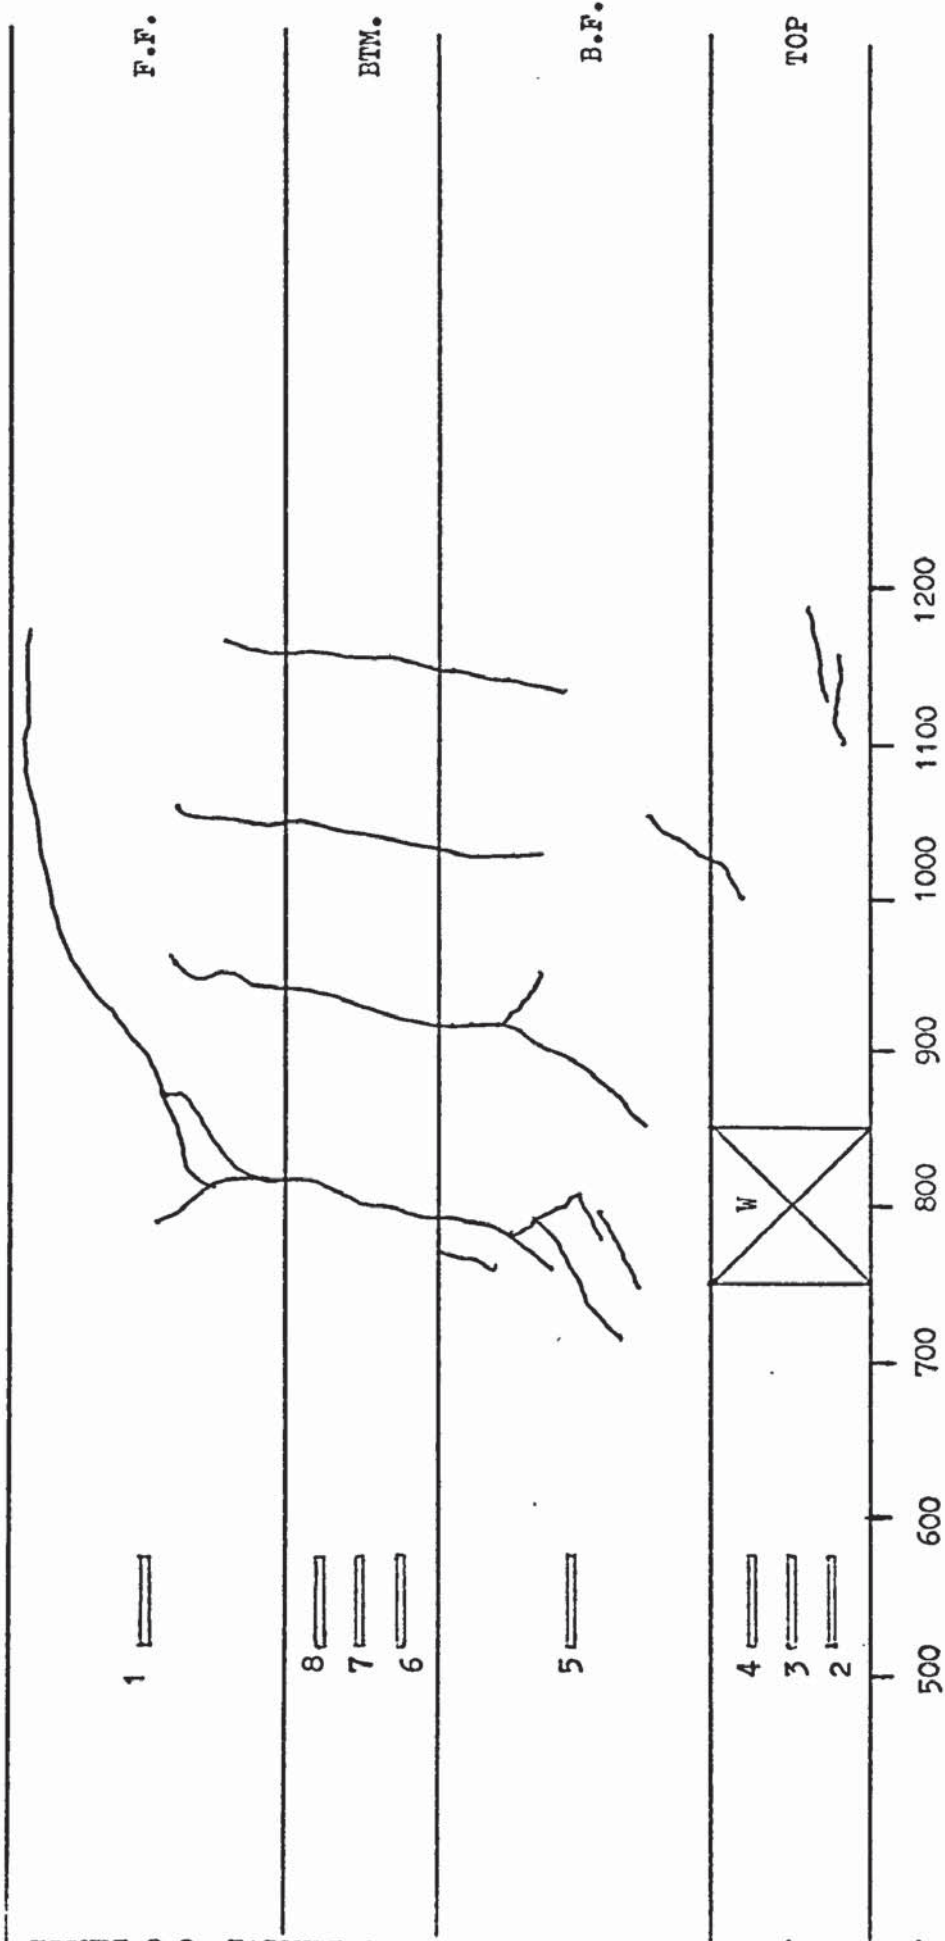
FAILURE CRACK PATTERNS - BEAM 9 (MODE 1)
